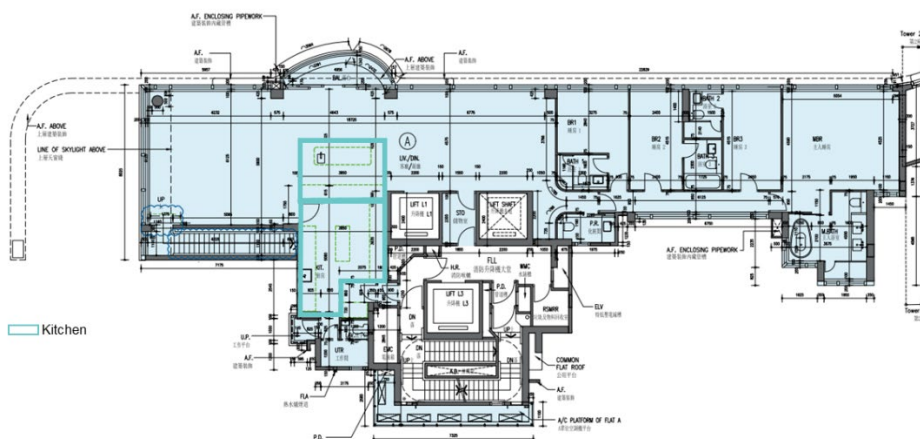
Floor Plan with Dual-Kitchen Arrangement at JARDINI in Tai Hang¹¹ (Modified by Author)
